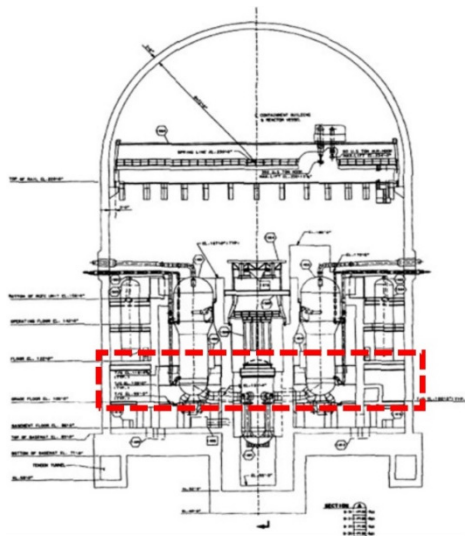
OPR-1000 containment building section (Gim *et al.* 2021)
